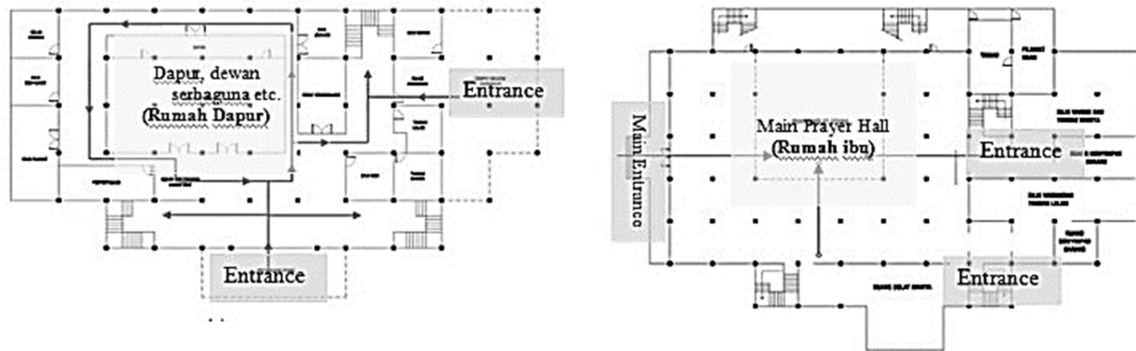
Ground floor (left) and First-floor plan (right) Masjid Jamek Sultan Abdul Aziz Shah
